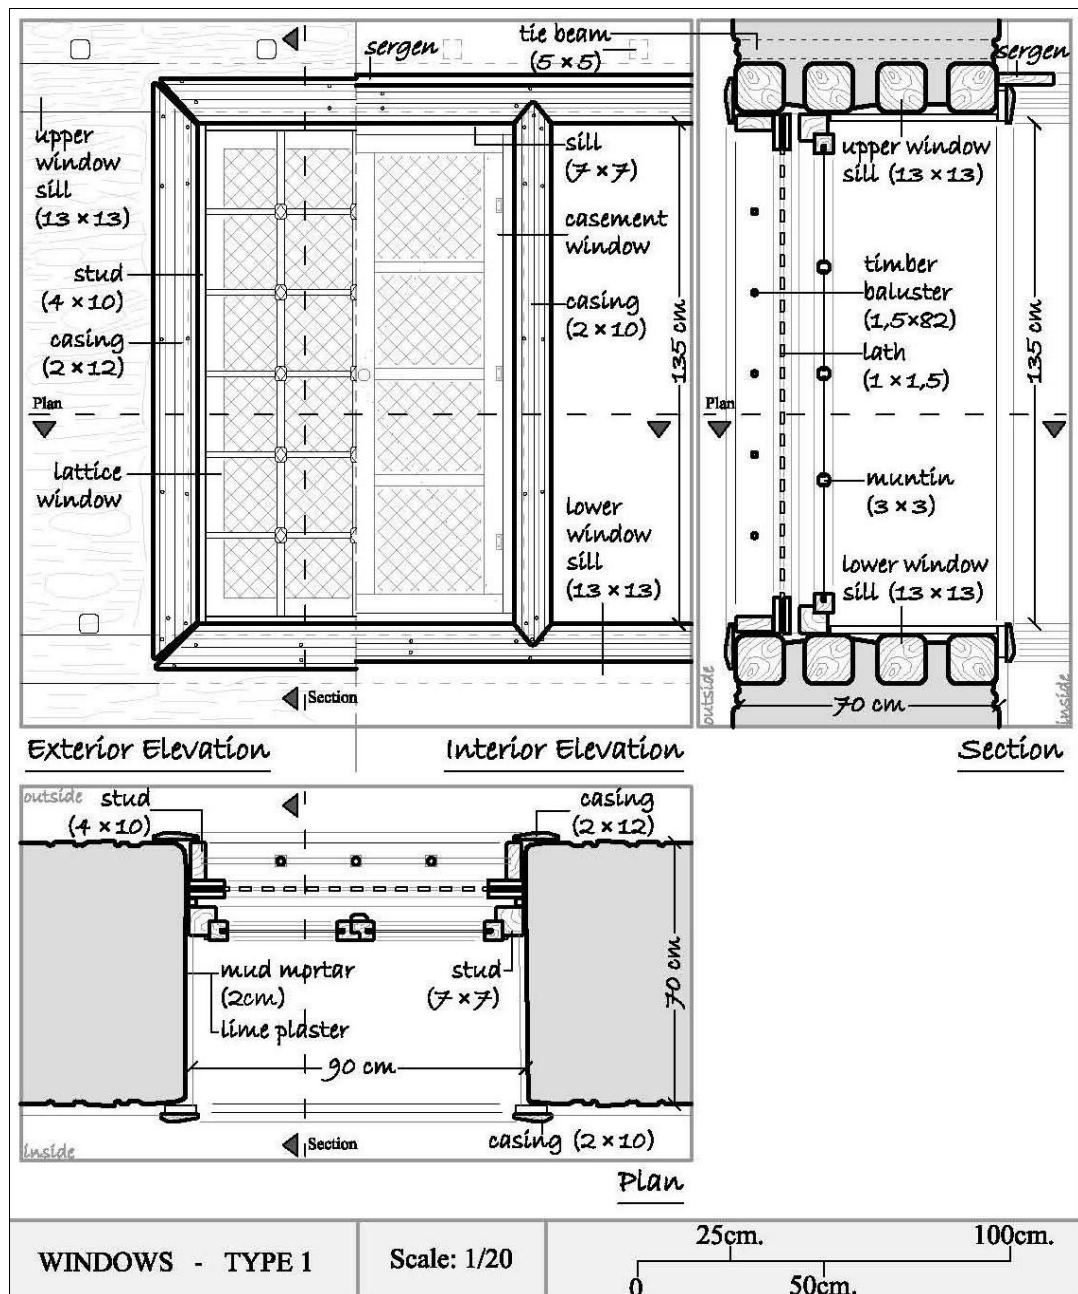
, Window openings Type 1(Camikebir Quarter 1. Beyzade Street No: 10)
